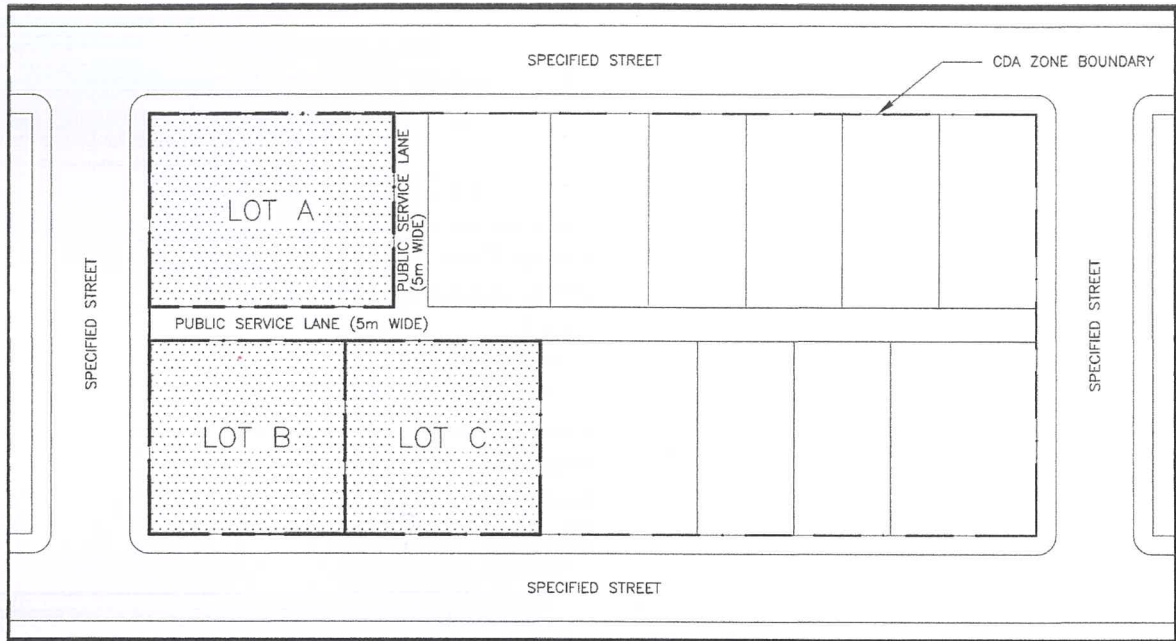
ORIGINAL LOTS BOUNDARY PLAN
